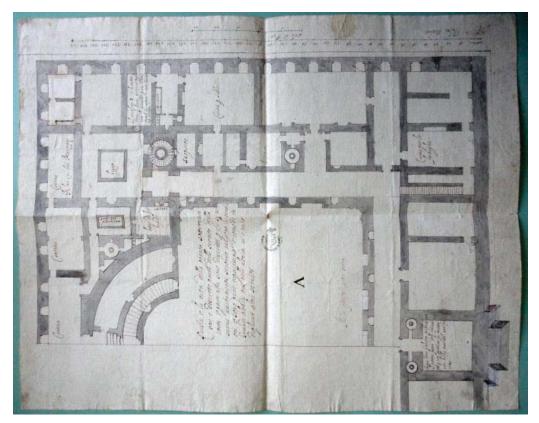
Giacinto Barozzi da Vignola, Palazzo Farnese, Piacenza, floor plan basement, 1560 to 1561 [1]
